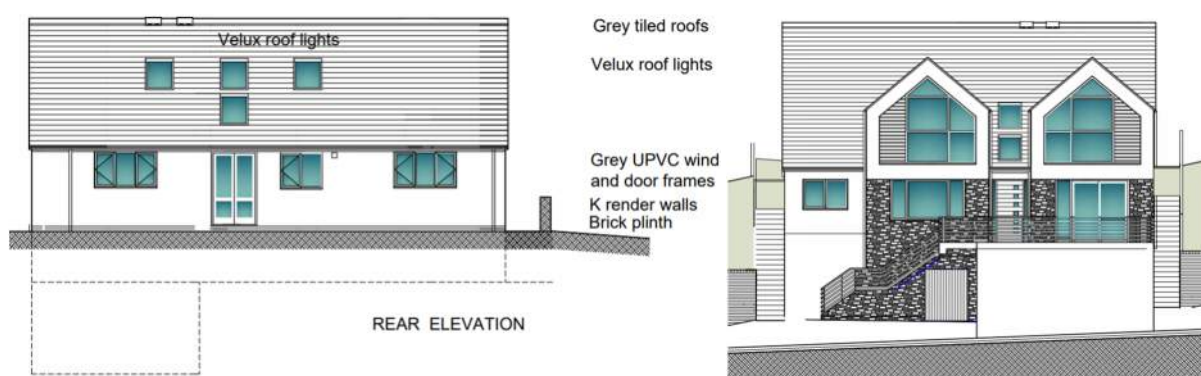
Extract from the submitted elevations for the Technical Details Consent (TDC) application (4/23/2164/PIP) showing the front and rear elevations.
